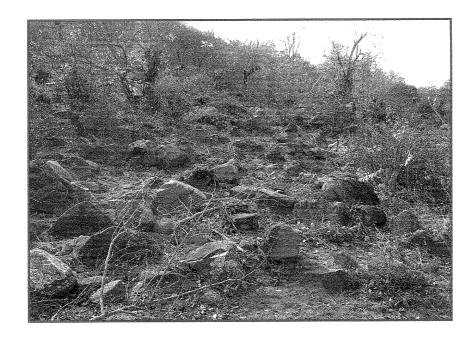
View of the proposed site for the construction of a reservoir at Masakhani village
